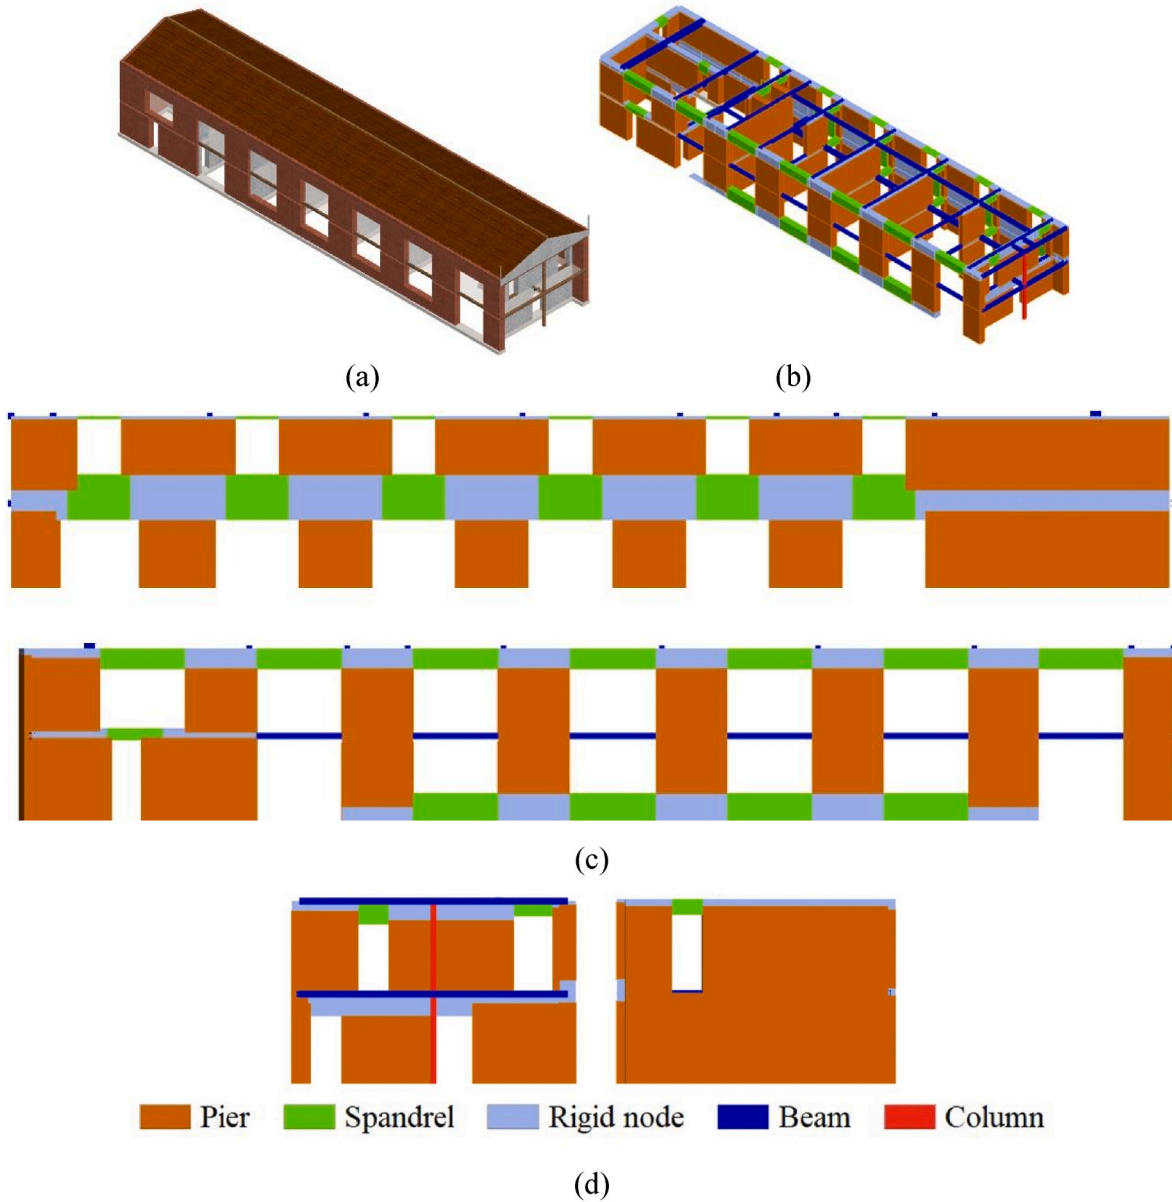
Numerical model of the masonry building: (a) geometry; (b) 3D equivalent frame model; façades in (c) longitudinal direction and (d) transversal direction.
